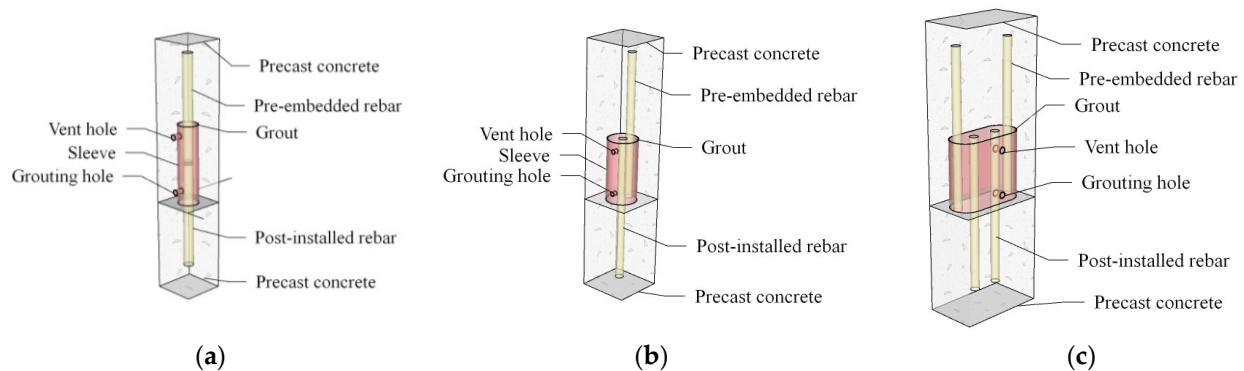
Schematic of grouted sleeve connector: (a) grouted splice connector; (b) type-I grouted lapping connector; and (c) type-II grouted lapping connector.
